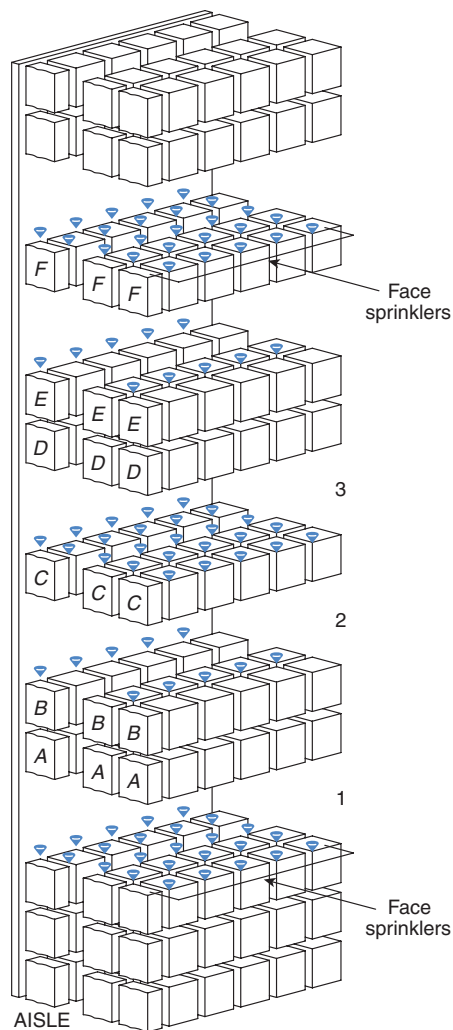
Positioning of In-Rack Sprinklers in
